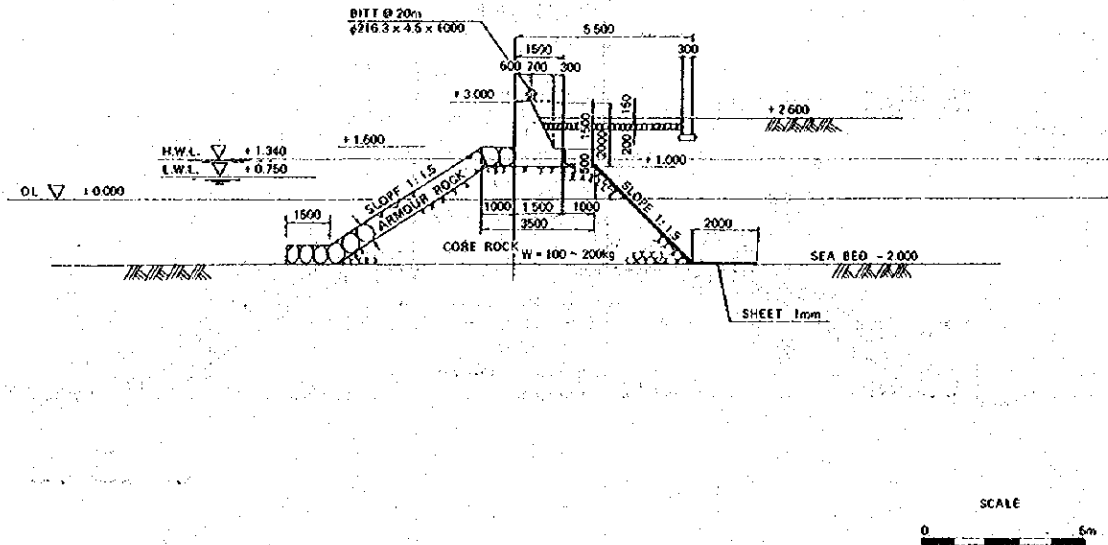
Cross Section of Rock Bulkhead -- Iloilo Port
